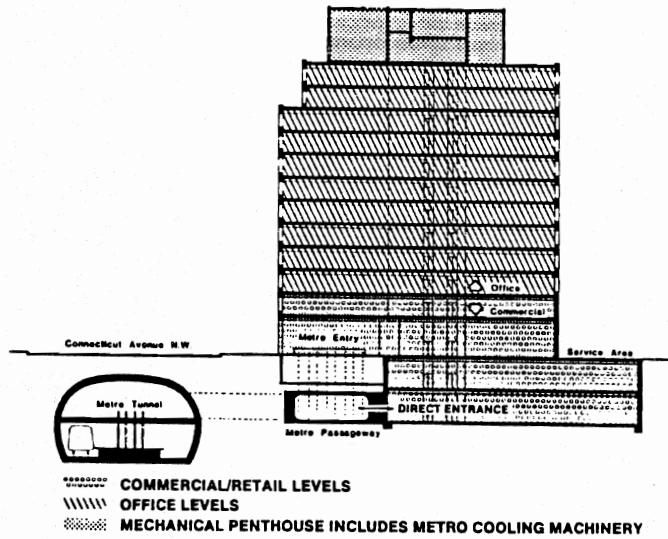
Layout of 1101 Connecticut Avenue, Washington, D.C. (Ref 13).
